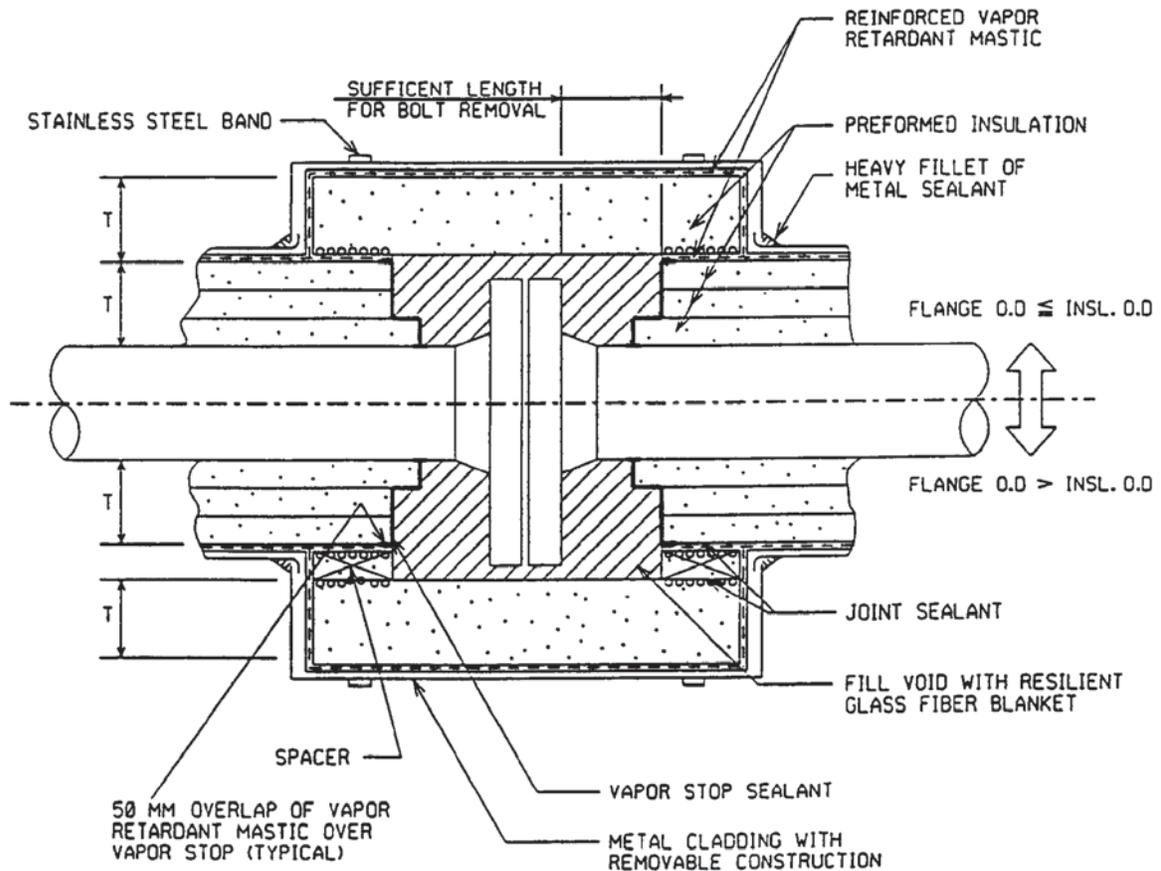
Insulation Detail-Flanged Joint for Cold Service
